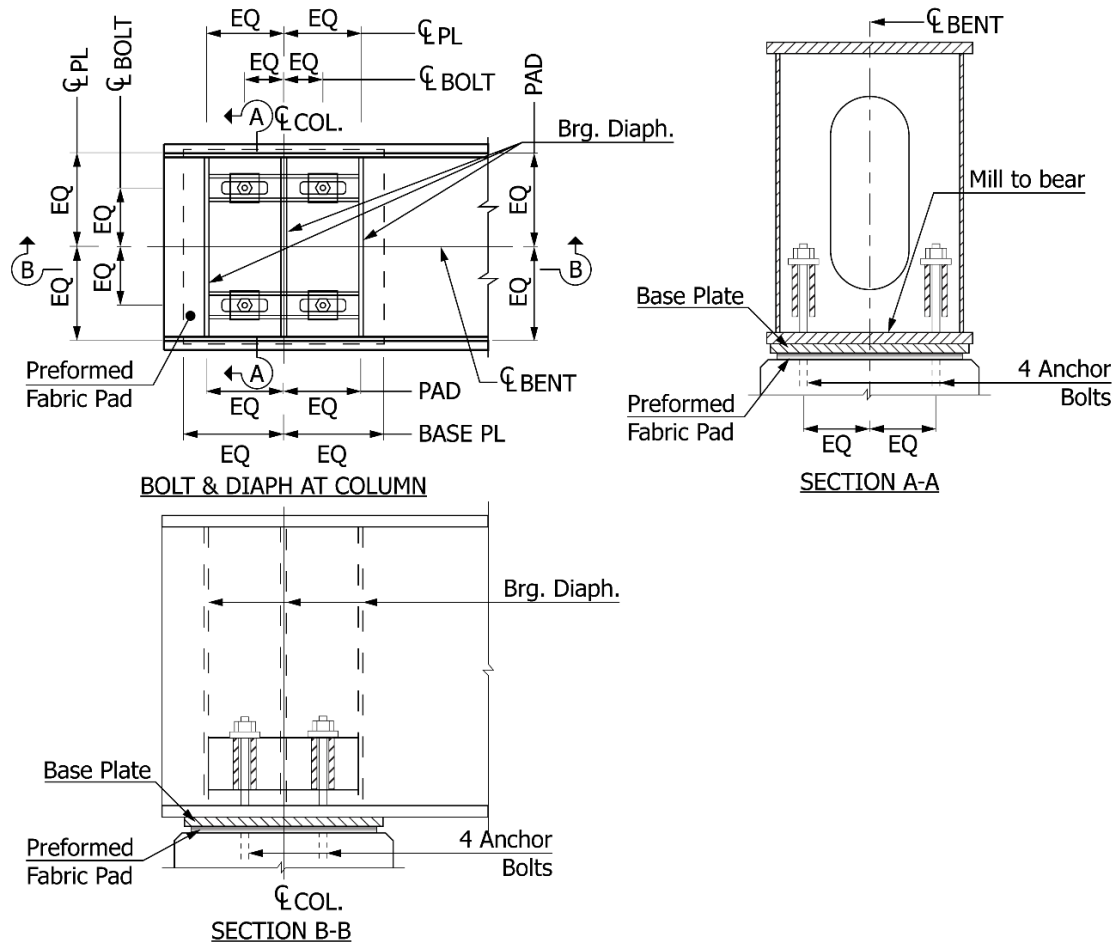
Typical support details for the steel box caps (adapted from TxDOT typical details, not to scale)
